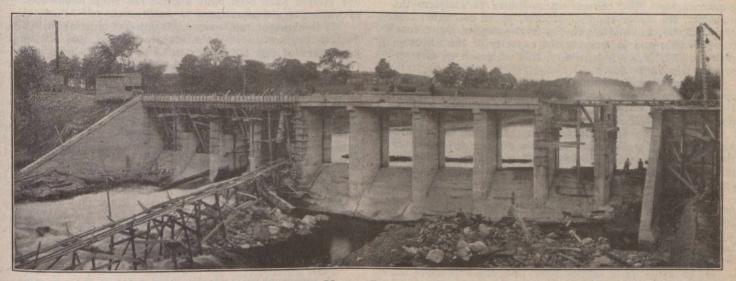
DAM UNDER CONSTRUCTION—PART OF MIXING PLANT AT EXTREME LEFT—TRESTLE TO POWER HOUSE IN LEFT FOREGROUND
